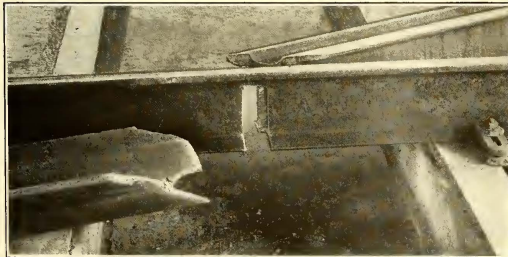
THROUGH RAIL AND ABUTTING ENDS OF ARM RAILS CUT READY FOR WELDING. FIG. 3—"JUMP" INTERSECTION WELD COMPLETE
